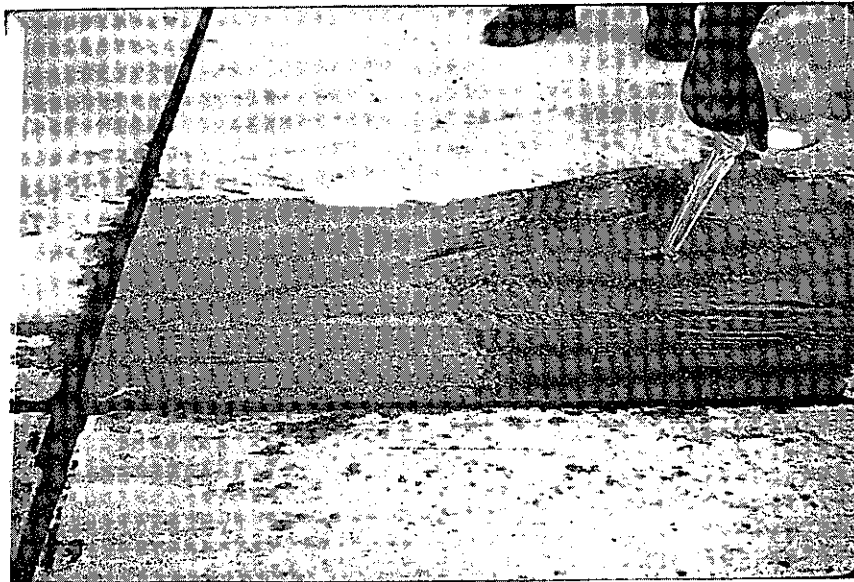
Shows water entering open joint in 16-in. PCC pavement constructed in 1969; gallon jug of water disappeared into joints shown in photo in about 1 minute.
